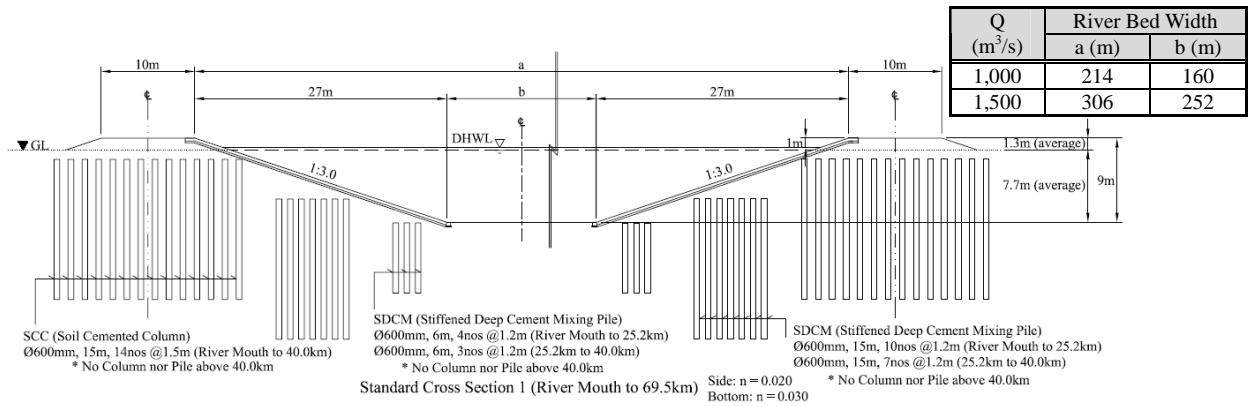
Standard Cross Section of West Diversion Channel with Slope Protection (0km to 69.5km)
